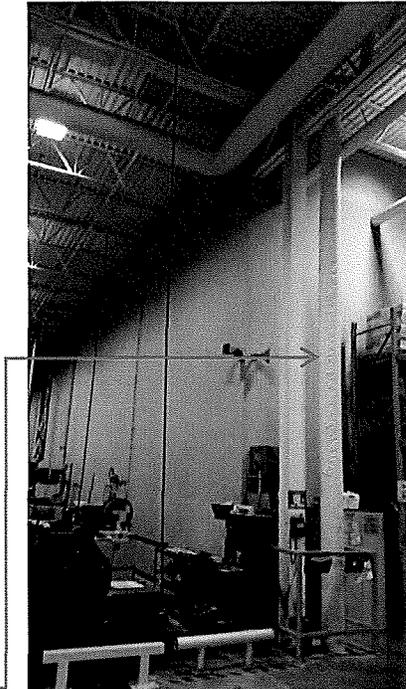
1301 Canal; typical return air duct to roof air exchanger, column C9.
